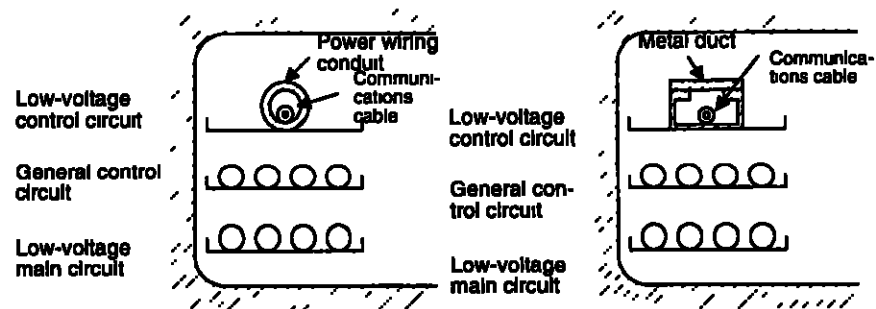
4 Wiring Using an Underground Pit or Underground Tunnel
